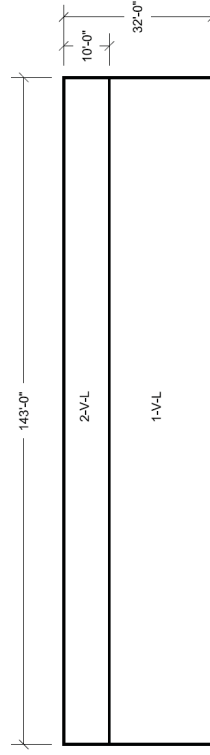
H.6-62: PUMP HOUSE SOUTH WALL LOOKING SOUTH
